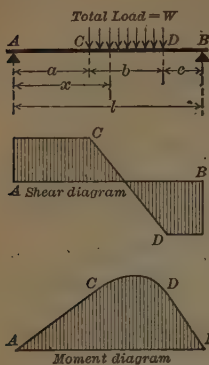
Beam Supported at Ends, Uniform Load over Part of Span.
